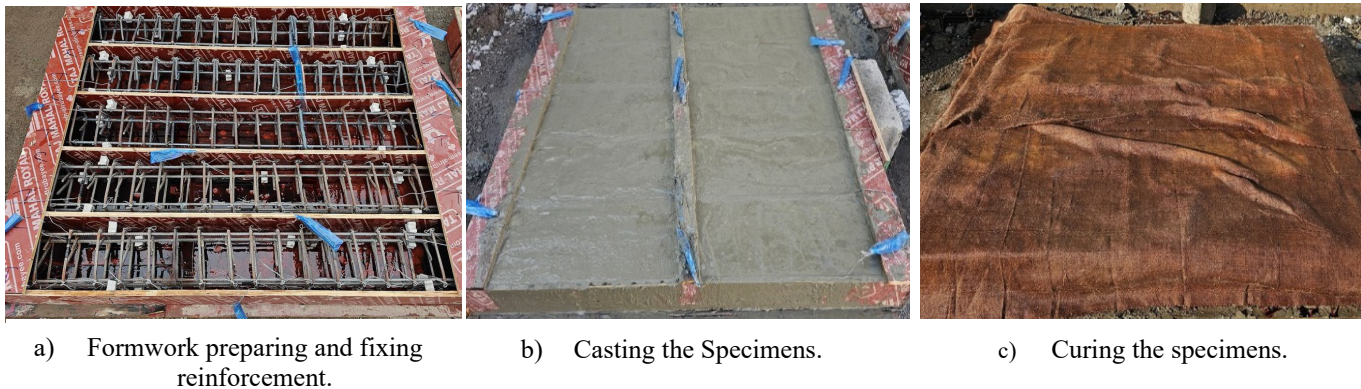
c). Fixing steel bars, casting and curing the specimens.
